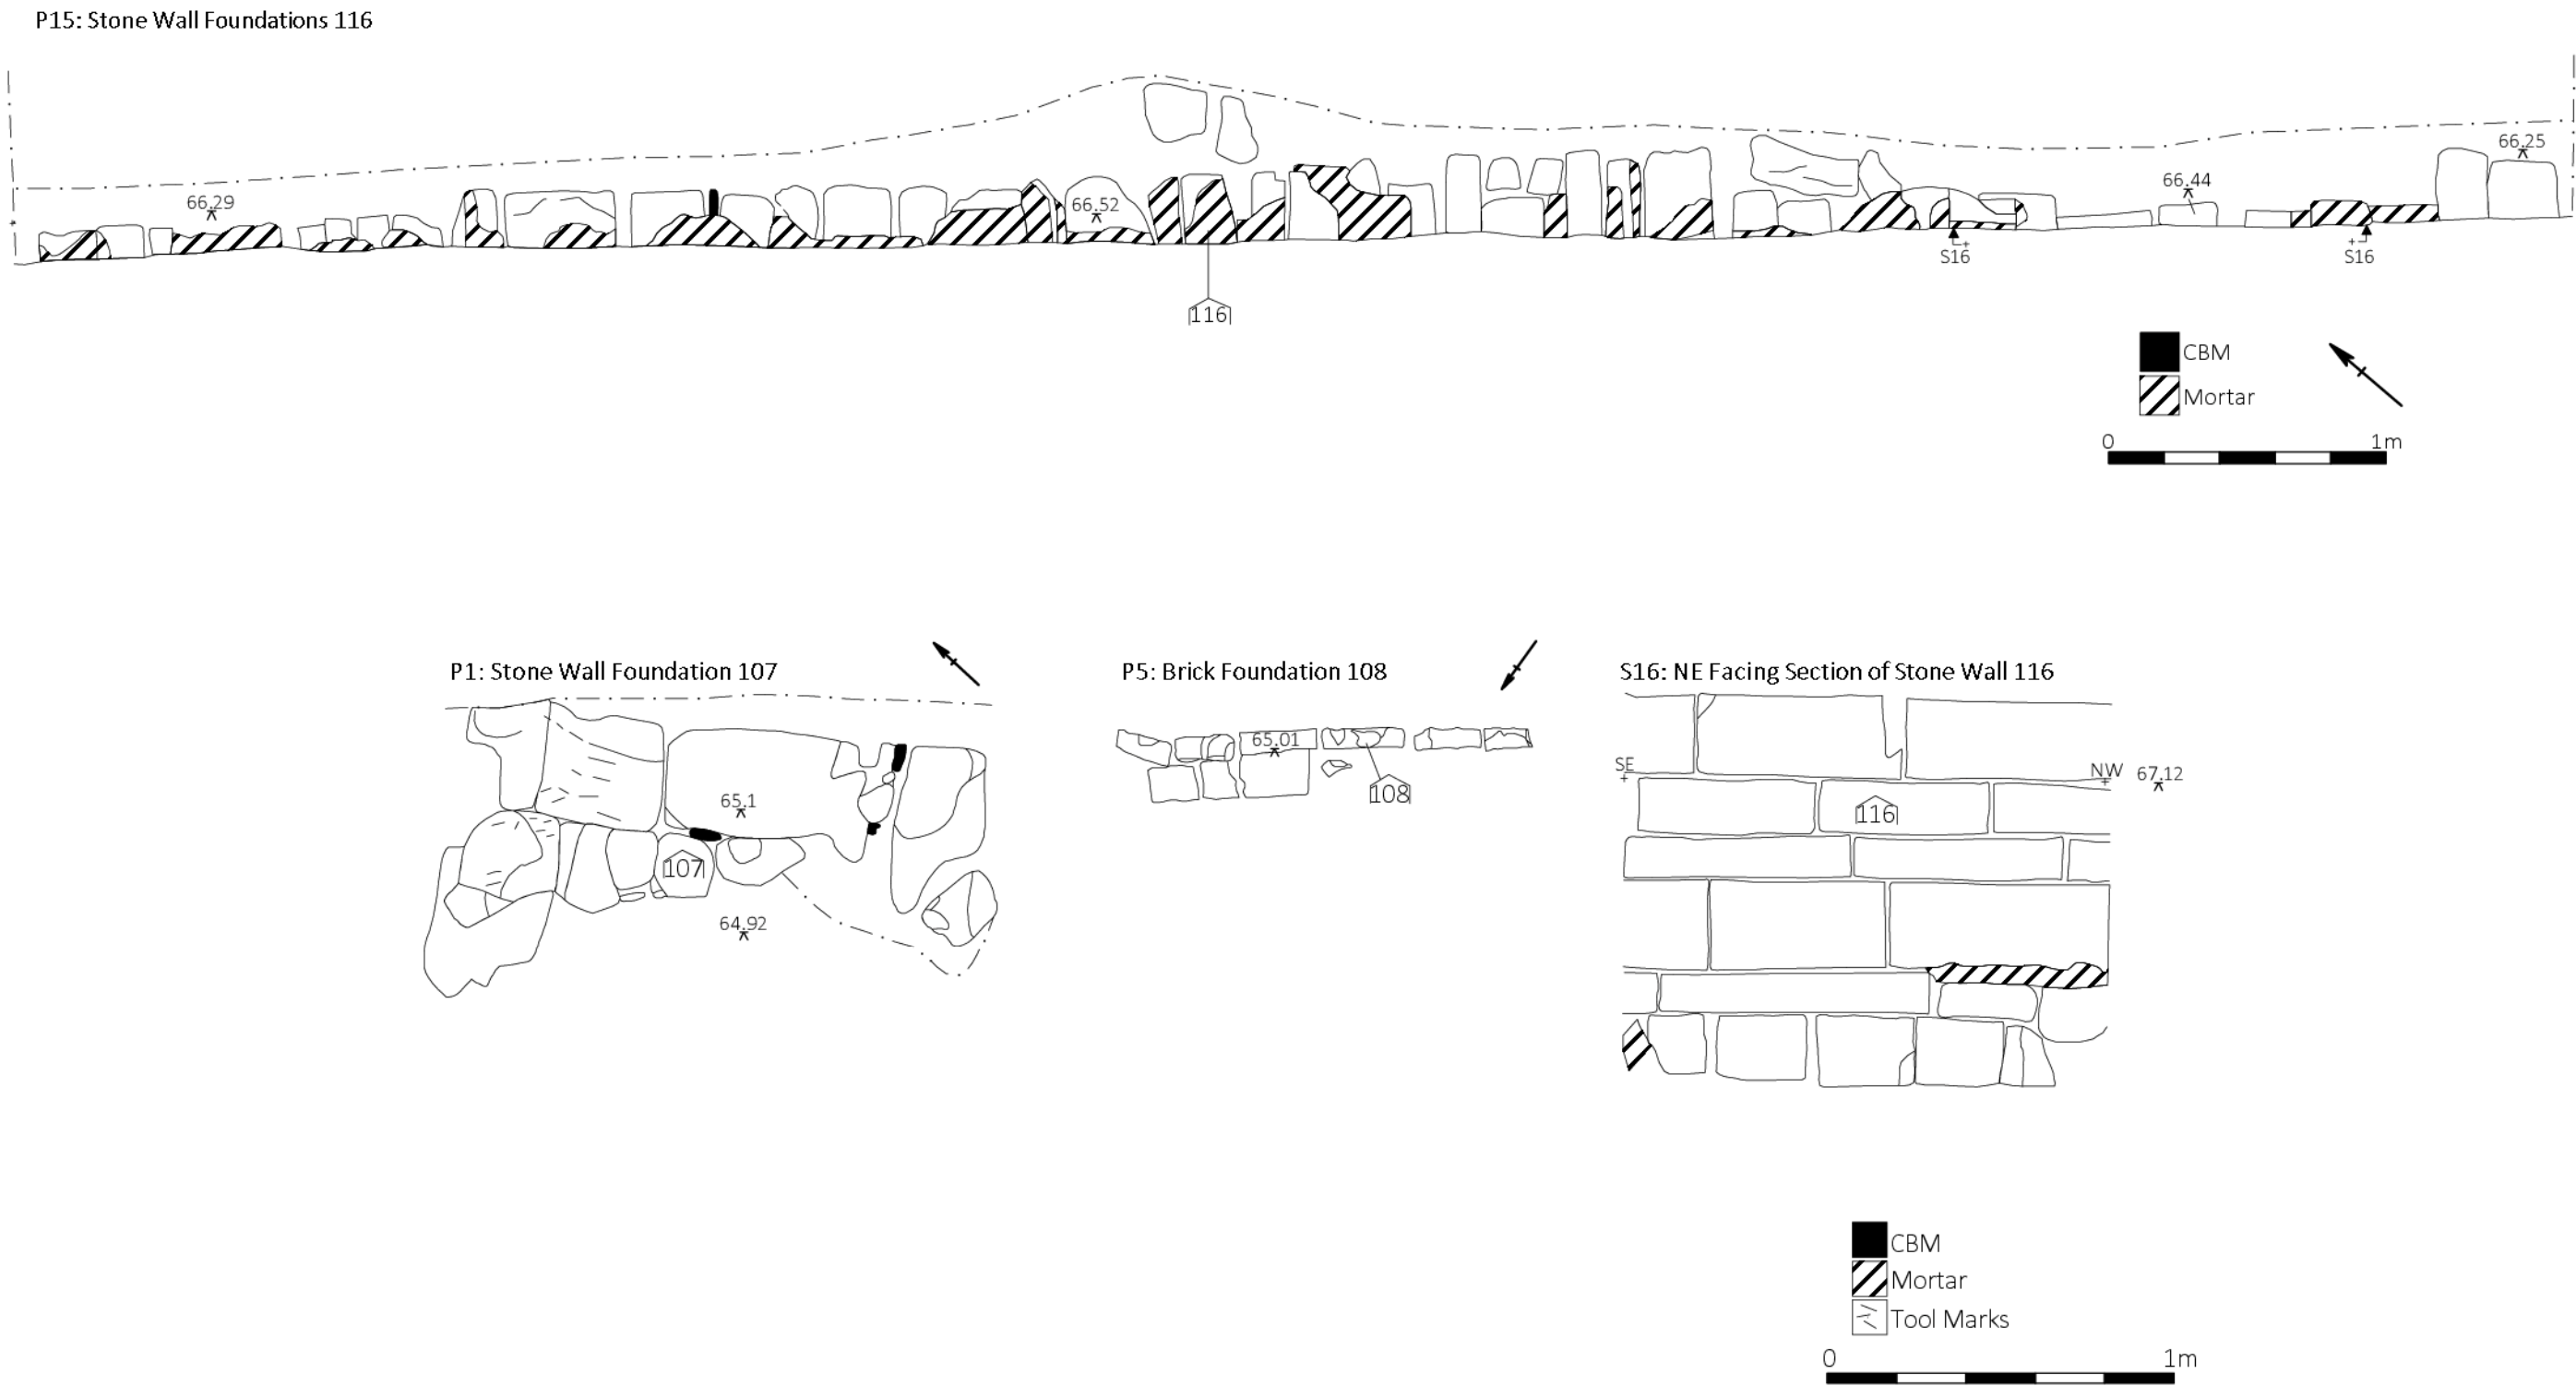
Strip, Map and Record plans and sections (plans 1:25/1:20; sections 1:20)
